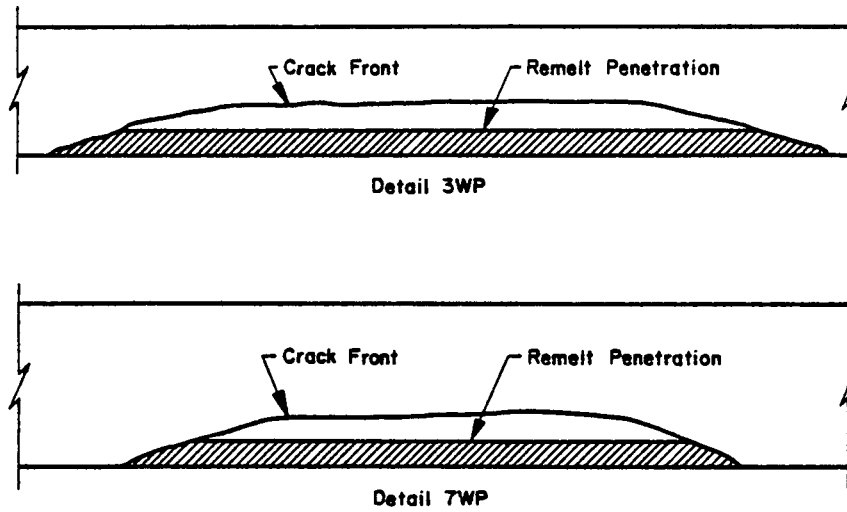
Crack Shape for Beams 3 and 7 (1976)
